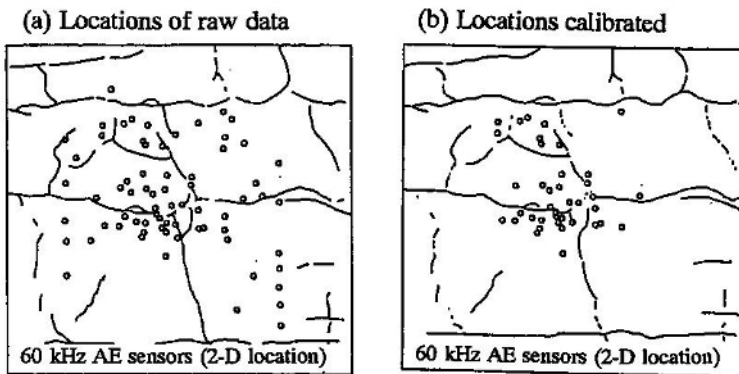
Two-dimensional AE locations in a retaining wall.
